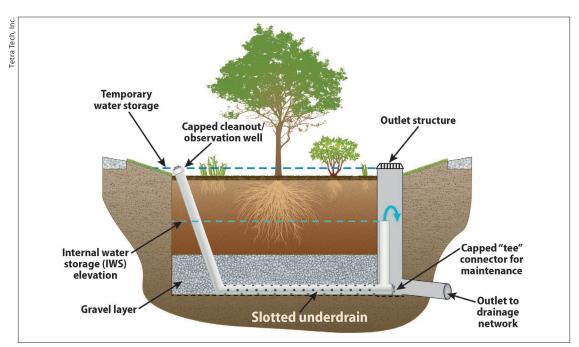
In this underdrain cross-section image, an upturned pipe design allows excess water to drain to an alternative drainage network while also ensuring a permanent internal water storage layer within the practice. An outlet structure can be included in the design to provide added protection against high volume flows.
